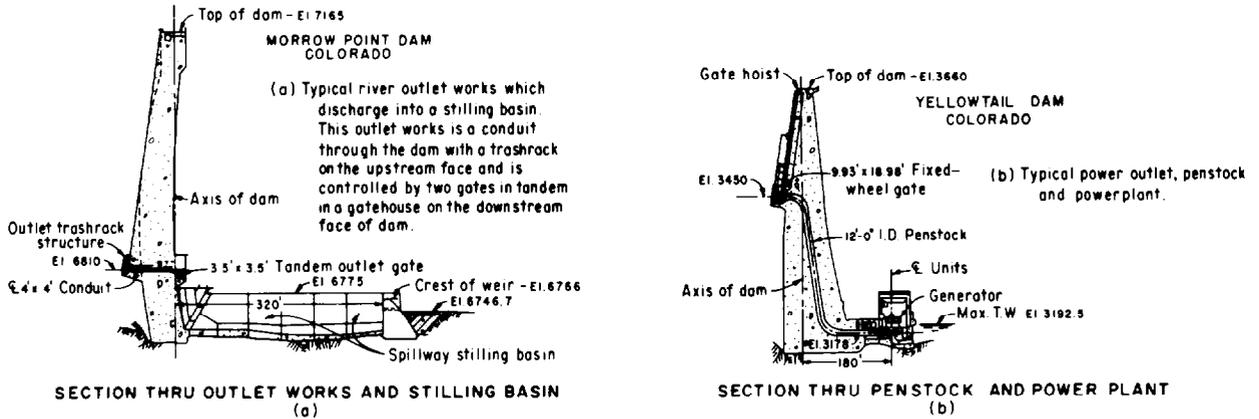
Typical river outlet works and power outlet. -288-D-3061
